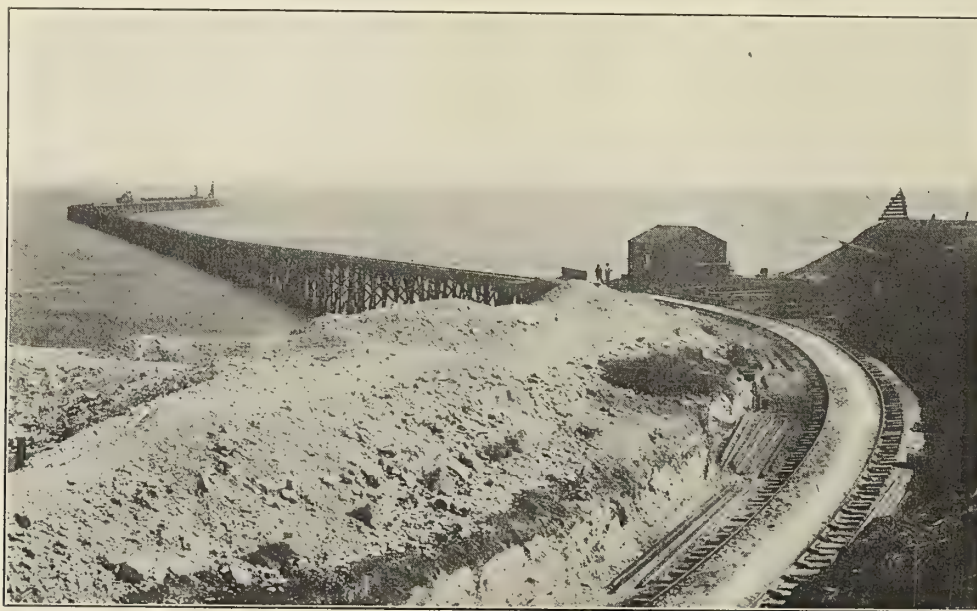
CONSTRUCTION PIER USED IN BUILDING THE BREAKWATER.
